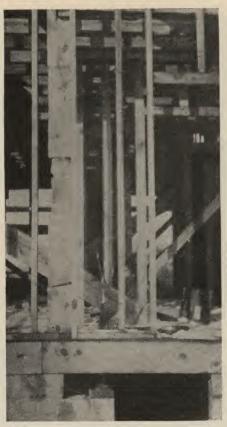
Showing How Odds and Ends of Joist and Studding Are Used for Backing.
